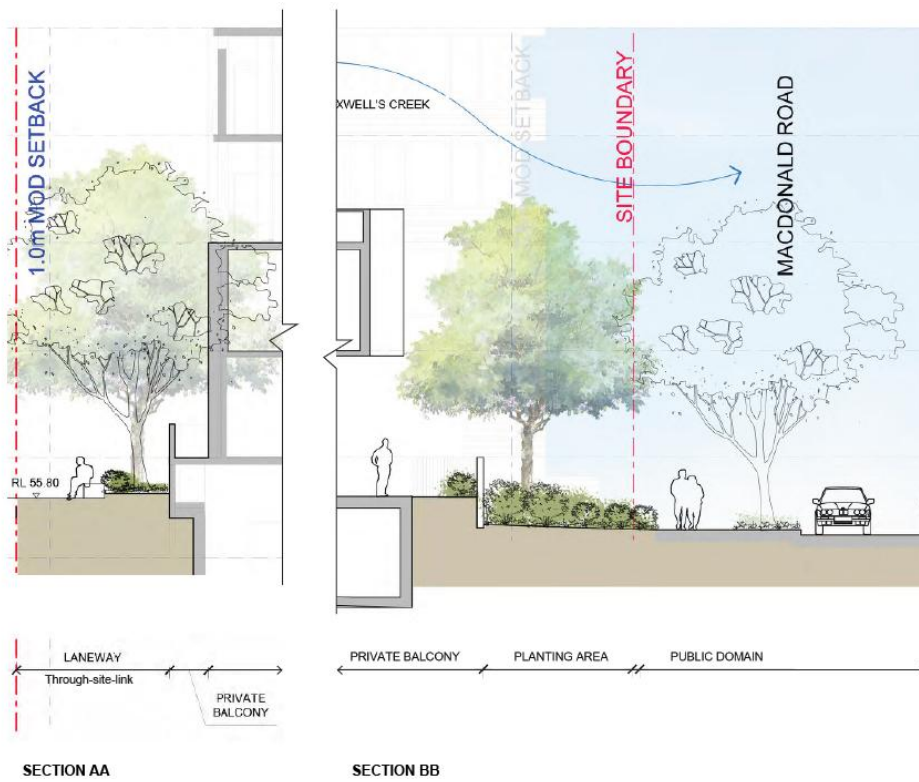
Landscape section to the laneway (Section AA) and to new McDonald Road (Section BB) (source: Taylor Brammer, 2026)
